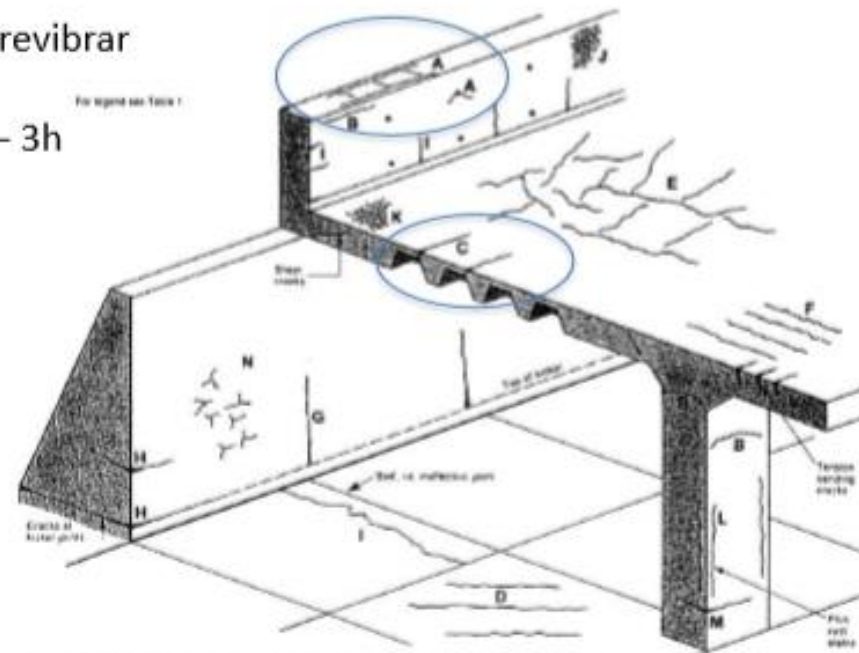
Examples of intrinsic cracks in hypothetical concrete structure
